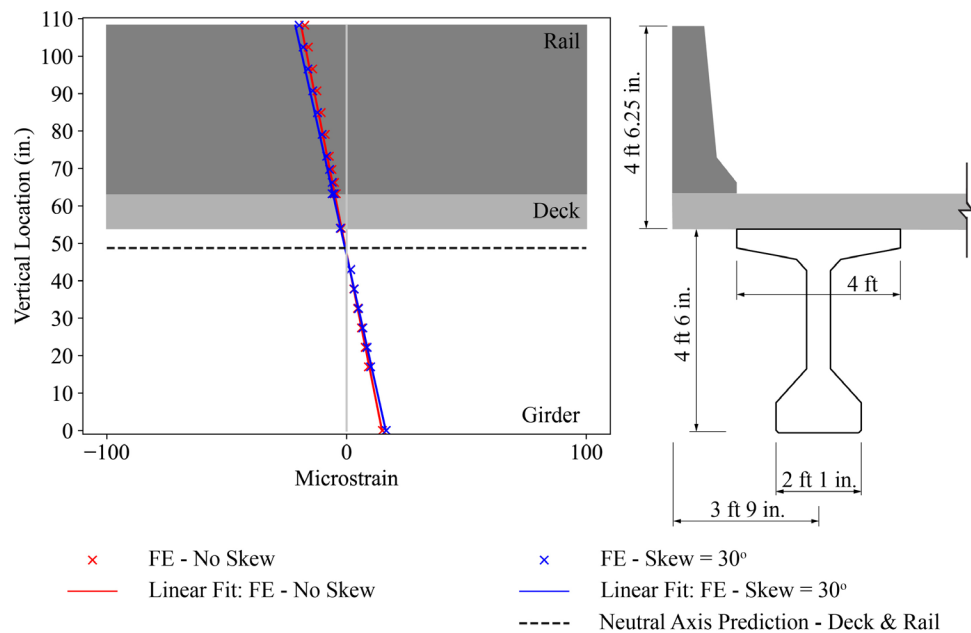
Effect of 30-degree skew angle for three-span continuous prestressed concrete girder bridge with FT rail: FE predictions for strains at peak positive moment location.
